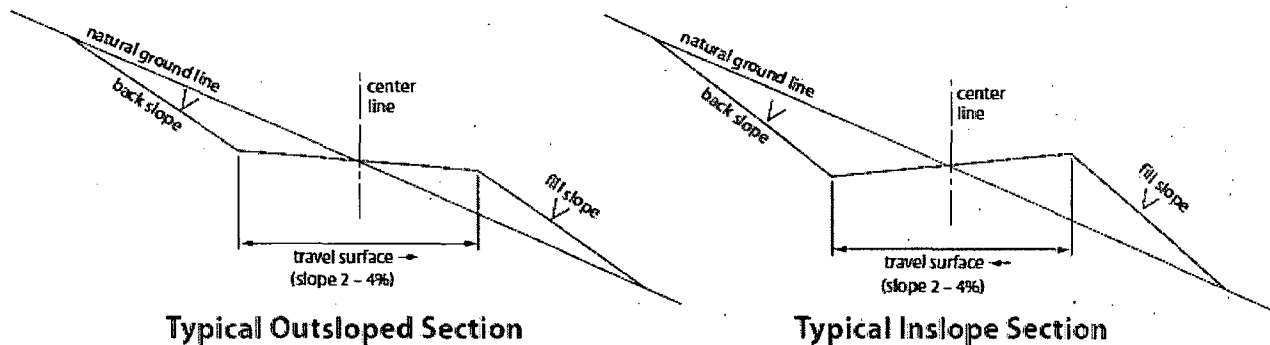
Cross-sections and plans for typical road sections representative of BLM resource or FS local and higher-class roads.
